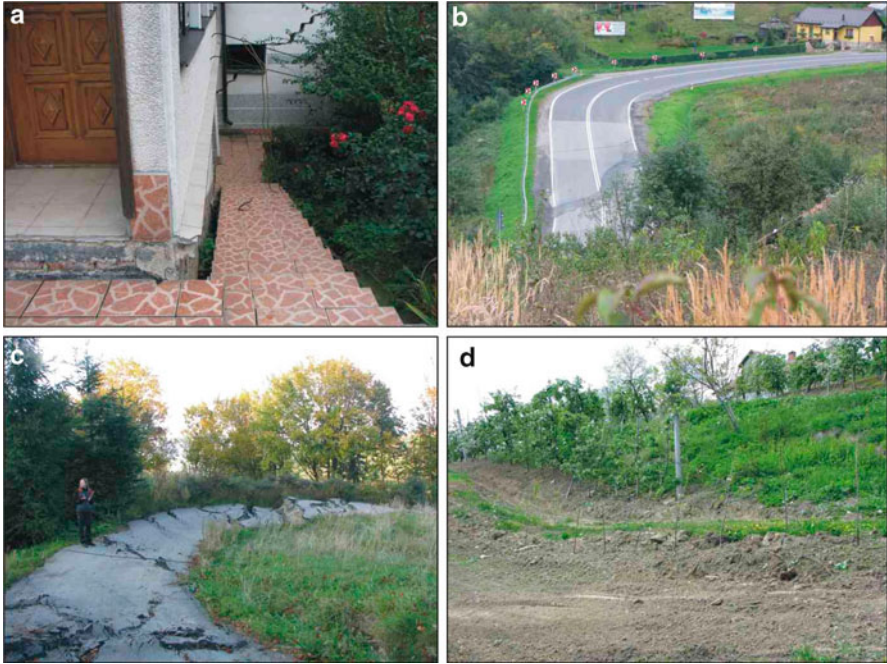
Examples of landslides damage in Łososina Dolna Commune. (a) Damaged house; (b) damaged national highway; (c) damaged local road; (d) damaged orchard
